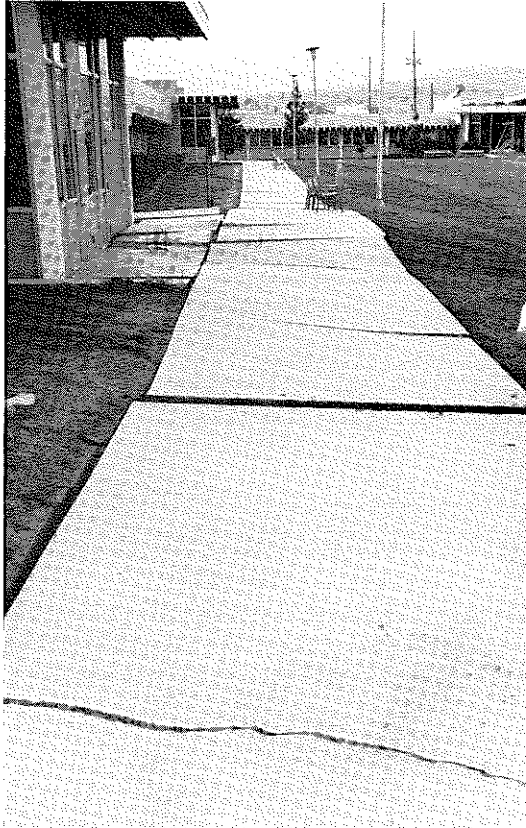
96 Sidewalk along western end of San Fernando Juvenile Facility.
